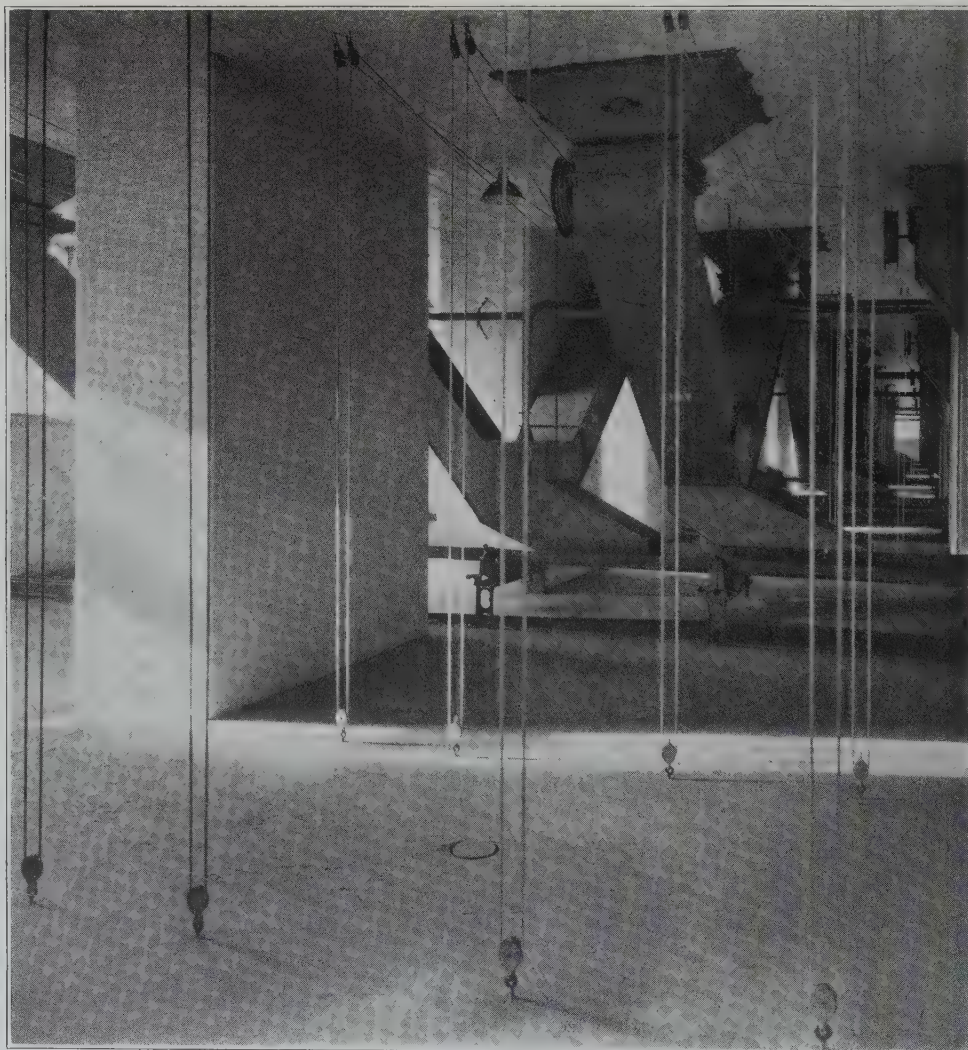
B. & O. Elevator. Basement of Storage Annex. Showing Drawoff Spouts and Bin Valve Ropes.
